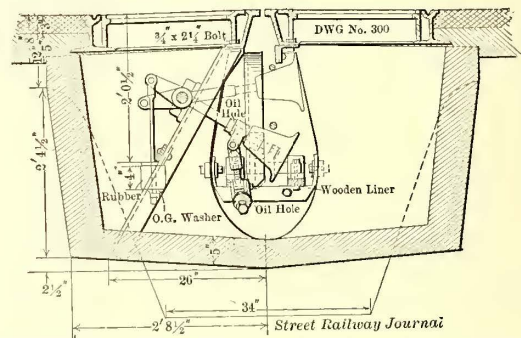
CROSS SECTION OF AUTOMATIC PICK-UP—WASHINGTON.
